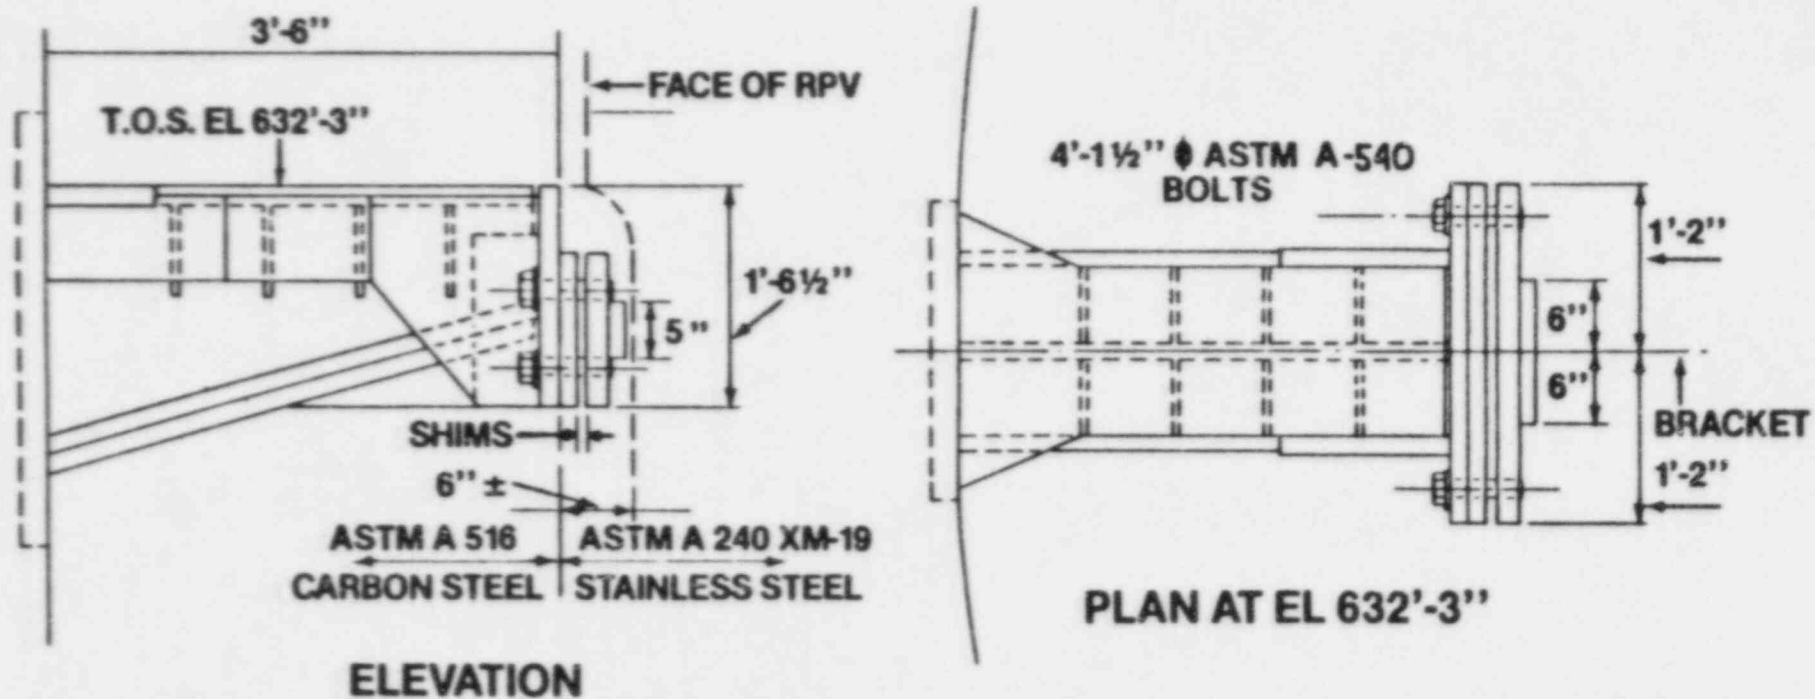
RPV UPPER LATERAL SUPPORT BRACKET DETAIL
